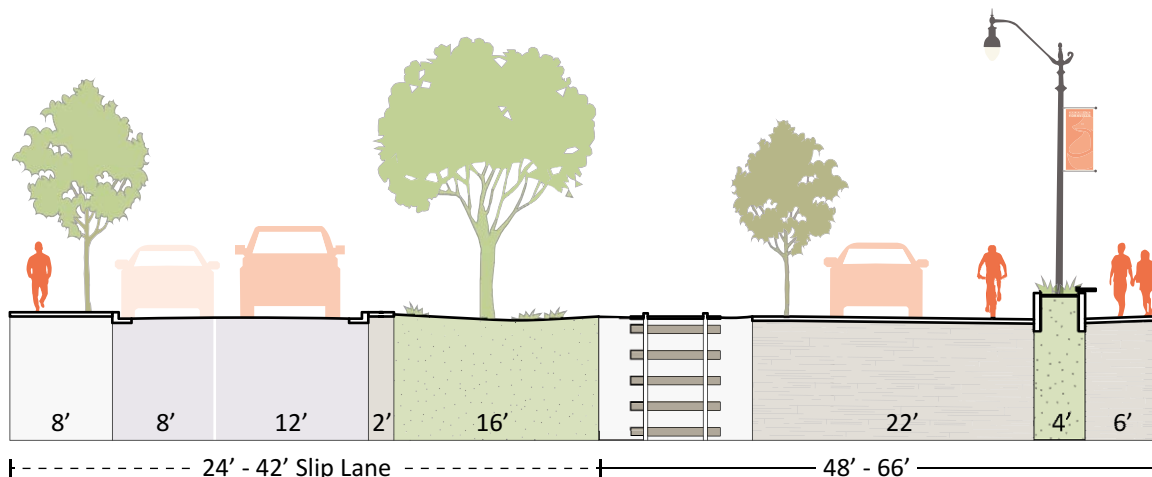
B (1). Hydraulic Street (Long-term).
